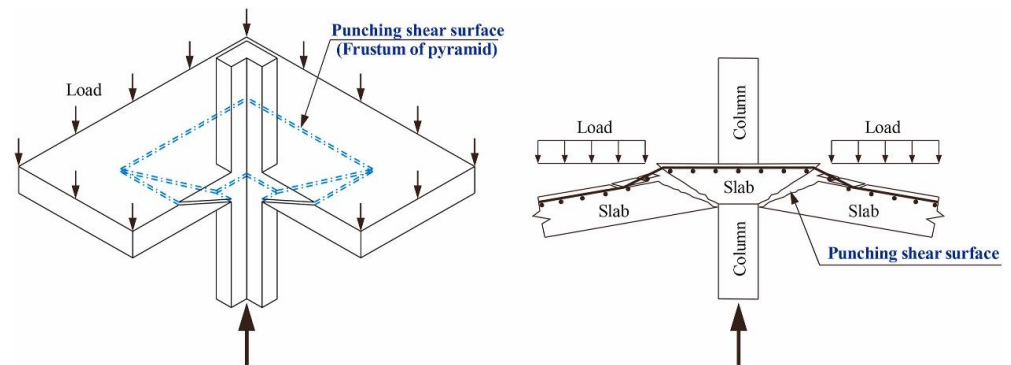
Punching shear failure in RC flat slabs without shear reinforcement.
